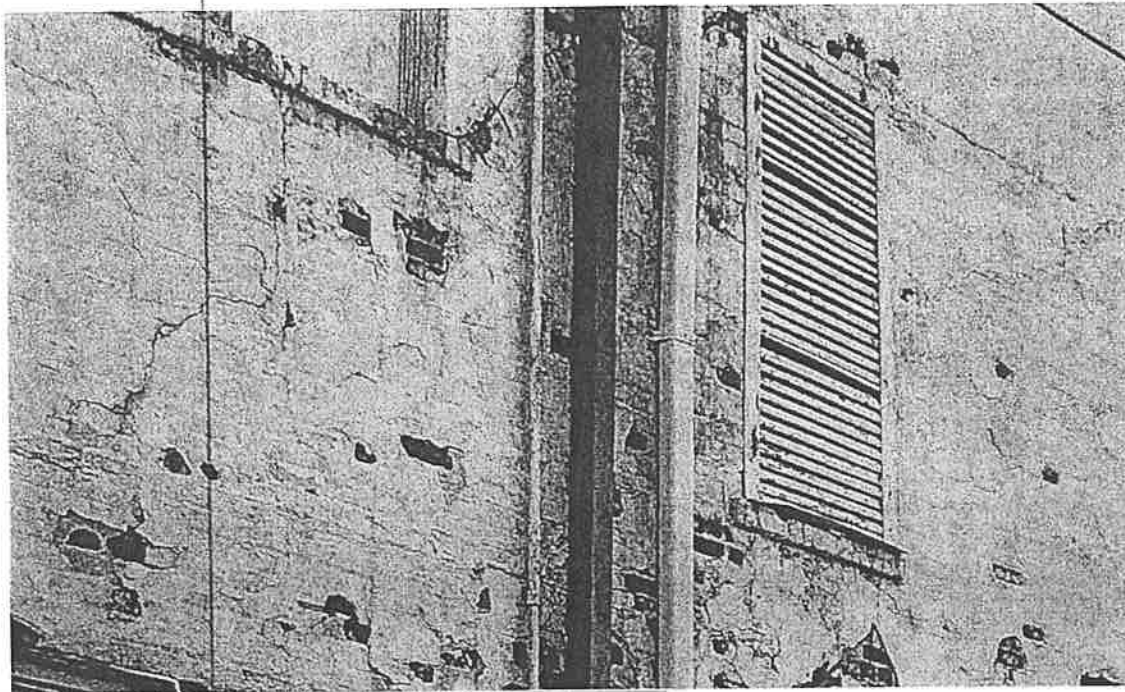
Network cracking, locally in coating and/or brick masonry.
